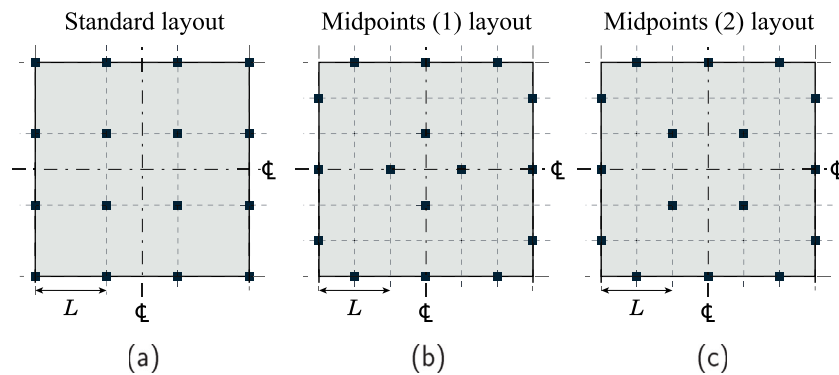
Three-by-three bay floor plate: column layouts investigated, (a) *standard* layout; (b) *midpoints (1)* layout; (c) *midpoints (2)* layout.
